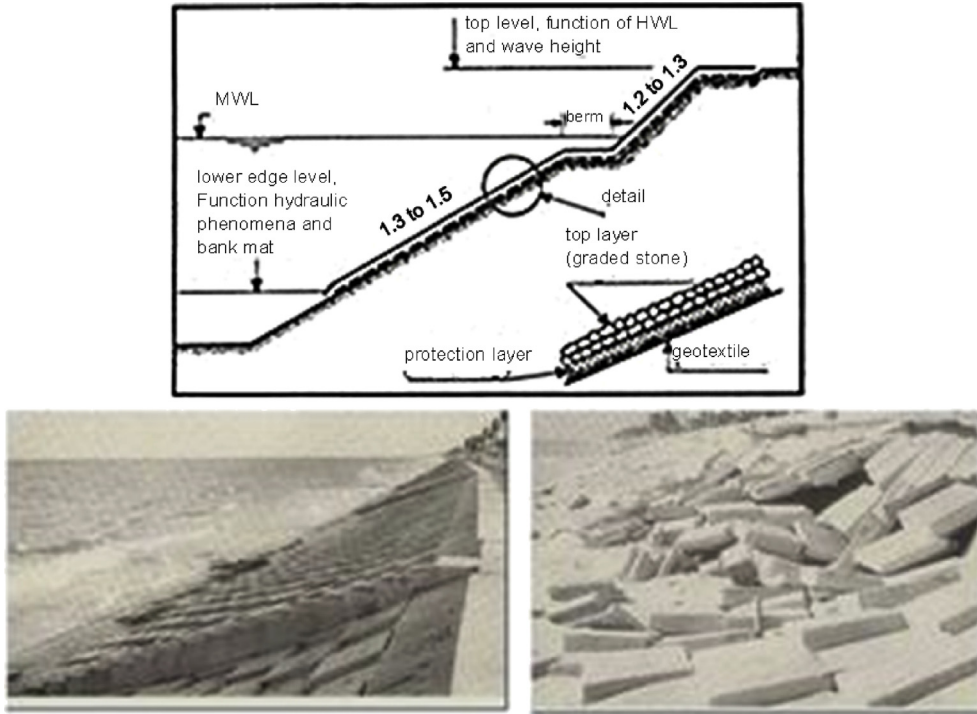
Typical armorment systems and example of failed block system. Modified after van Zanten and Thaket, 1982, and authors.
